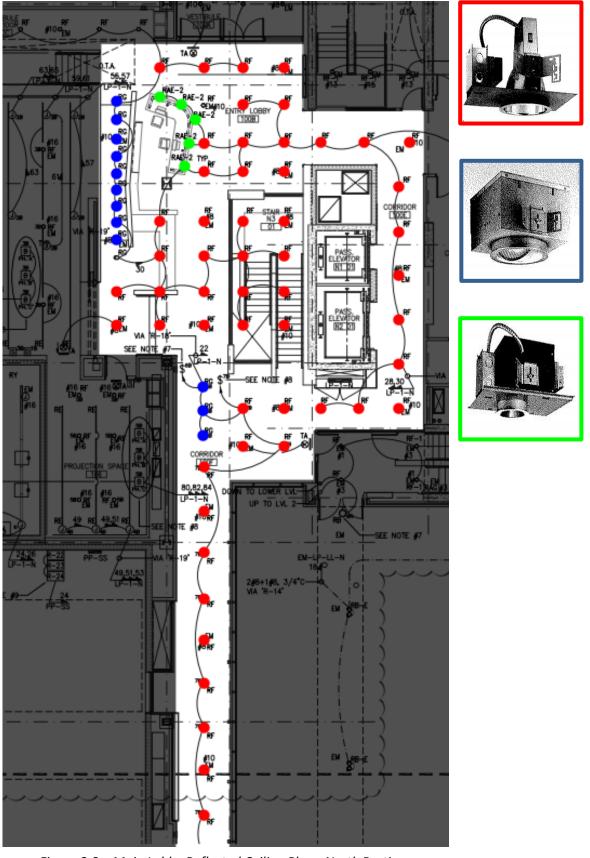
Main Lobby Reflected Ceiling Plan - North Portion
